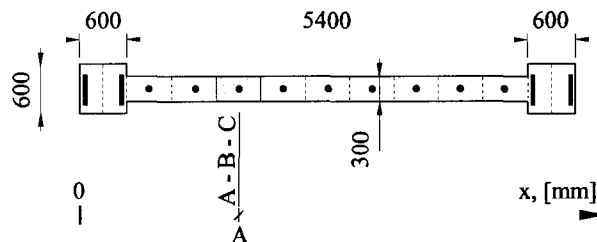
Modeling of shear wall sections for B6 located in Vancouver
